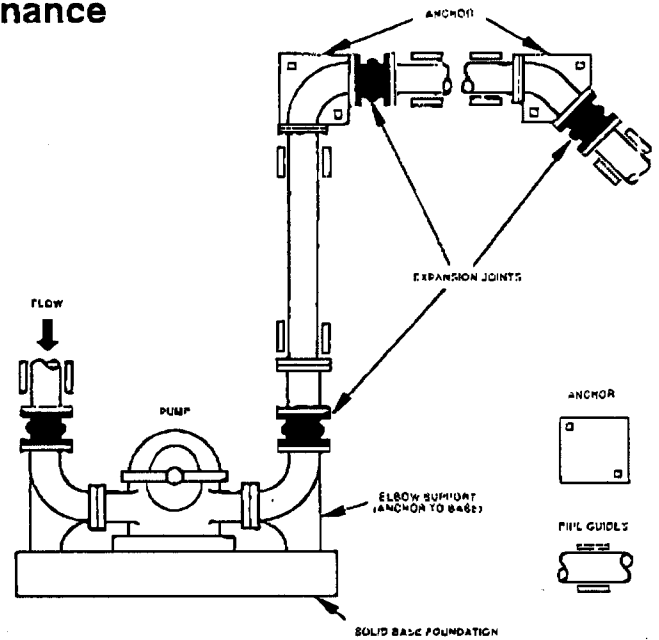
A: Typical Piping Layout Utilizing Expansion Joints When Equipment And Piping Are Properly Anchored
